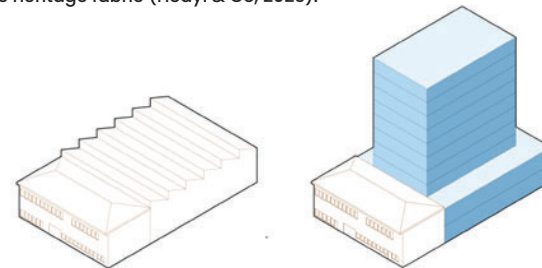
An example of industrial heritage building with a distinct element to the street that fronts a sawtooth warehouse space. This approach avoids facadism by maintaining the front element which allows the facade and roof form to be read from the public realm. The new development can then occupy the remaining site area of the former sawtooth warehouse (Hodyl & Co, 2023).
